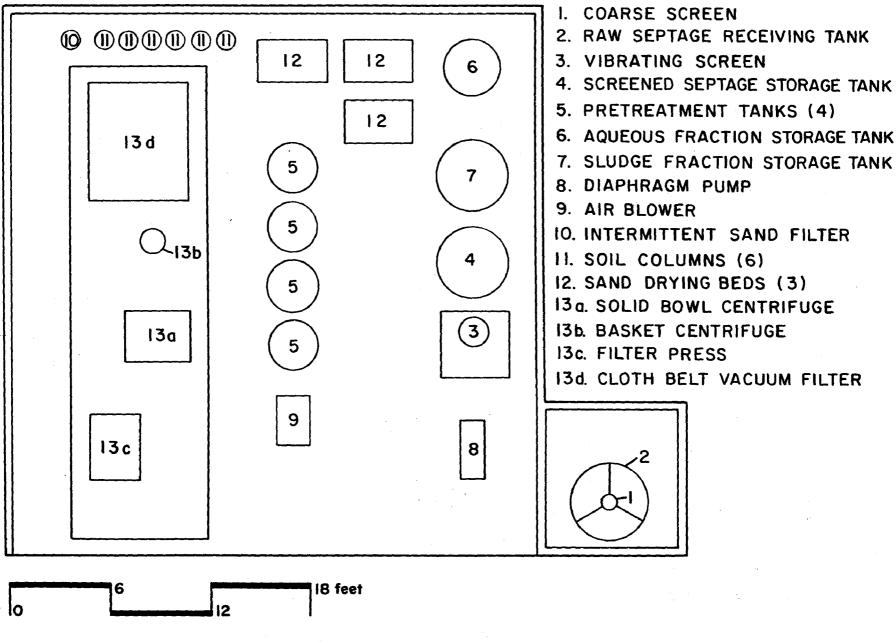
PLAN VIEW OF PILOT PLANT FACILITIES
